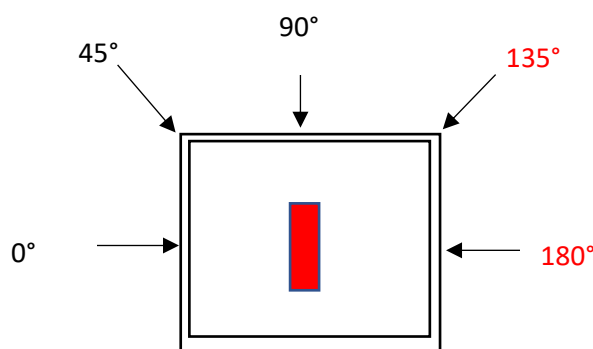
Wind incidence angle to building with standalone roof mounted solar thermal collector.
